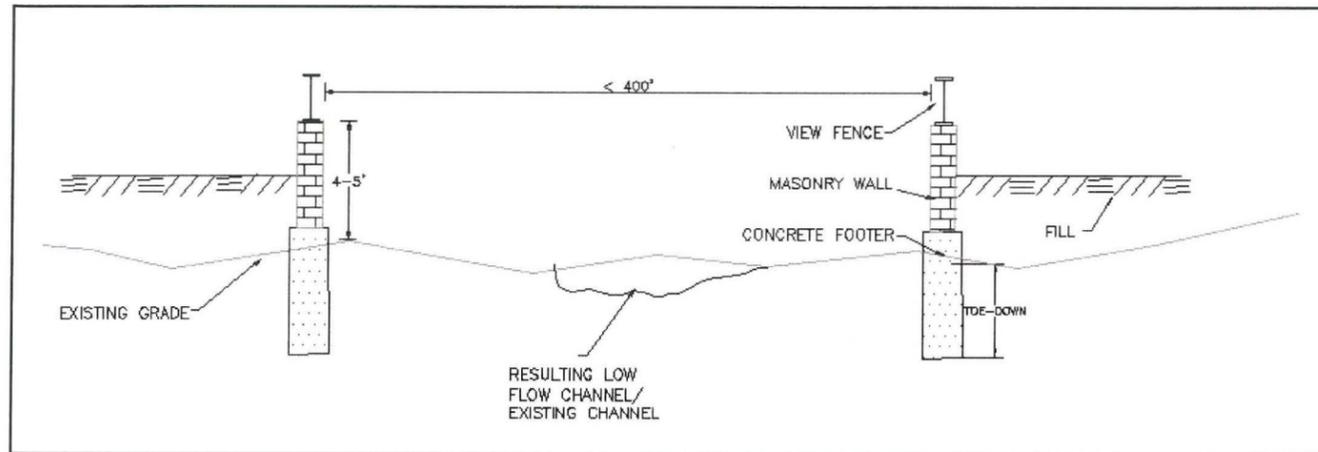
Concept Cross Section for Leveed Corridor with Walls (Alternatives A, B1, B2, B4, B5) (Not to scale)
